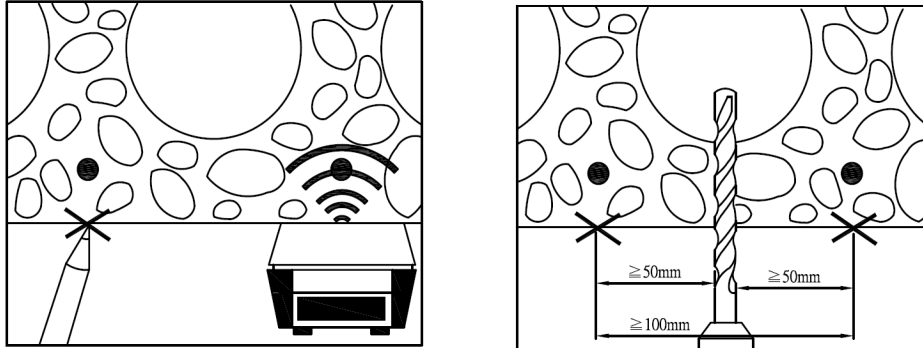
Installation parameter for anchorage in precast prestressed hollow core slabs
